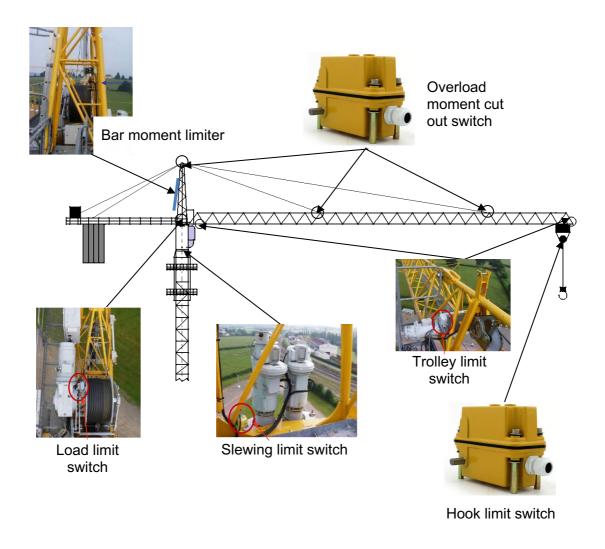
Position of safety switches on tower cranes (www.manitowoc.com)
